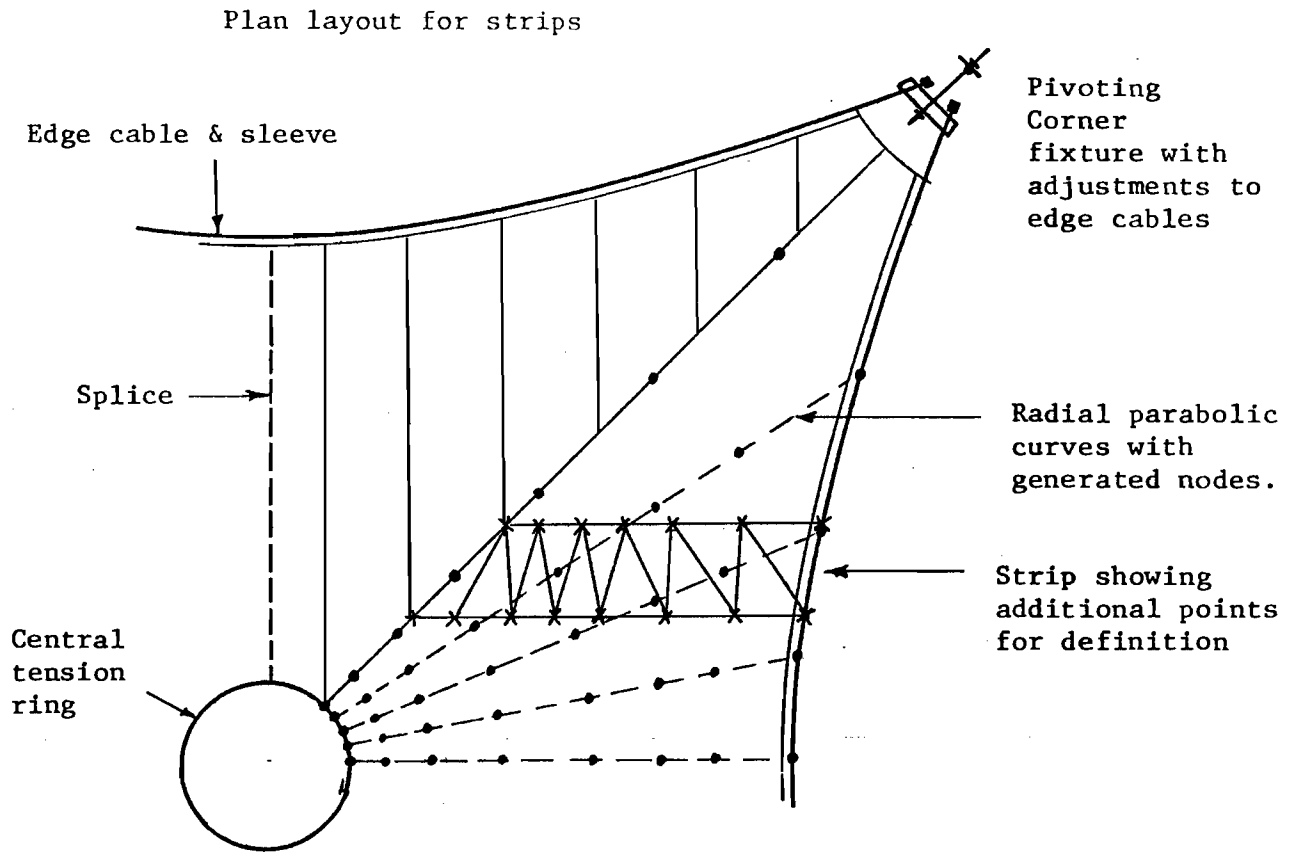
(a) PLAN VIEW OF ADOPTED CUTTING PATTERNS
